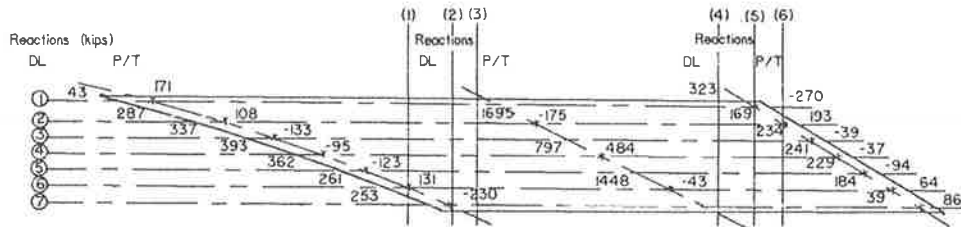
Sectional Framing Plan for WB Euclid/Park Ave. Bridge
